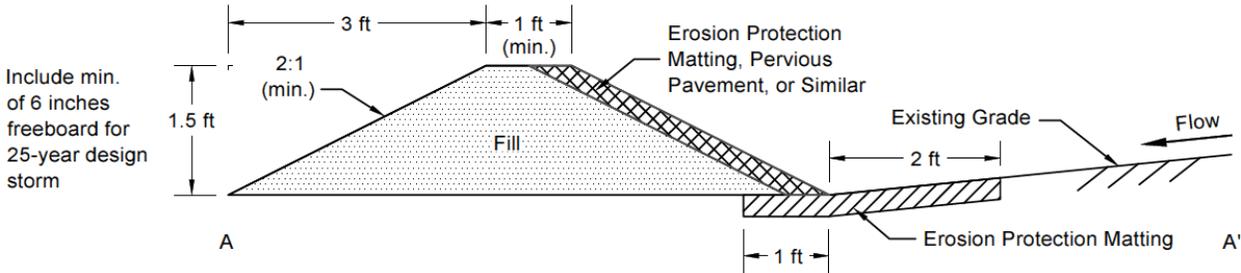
Proposed Diversion Berm Concept Design Cross-Section A – A'
